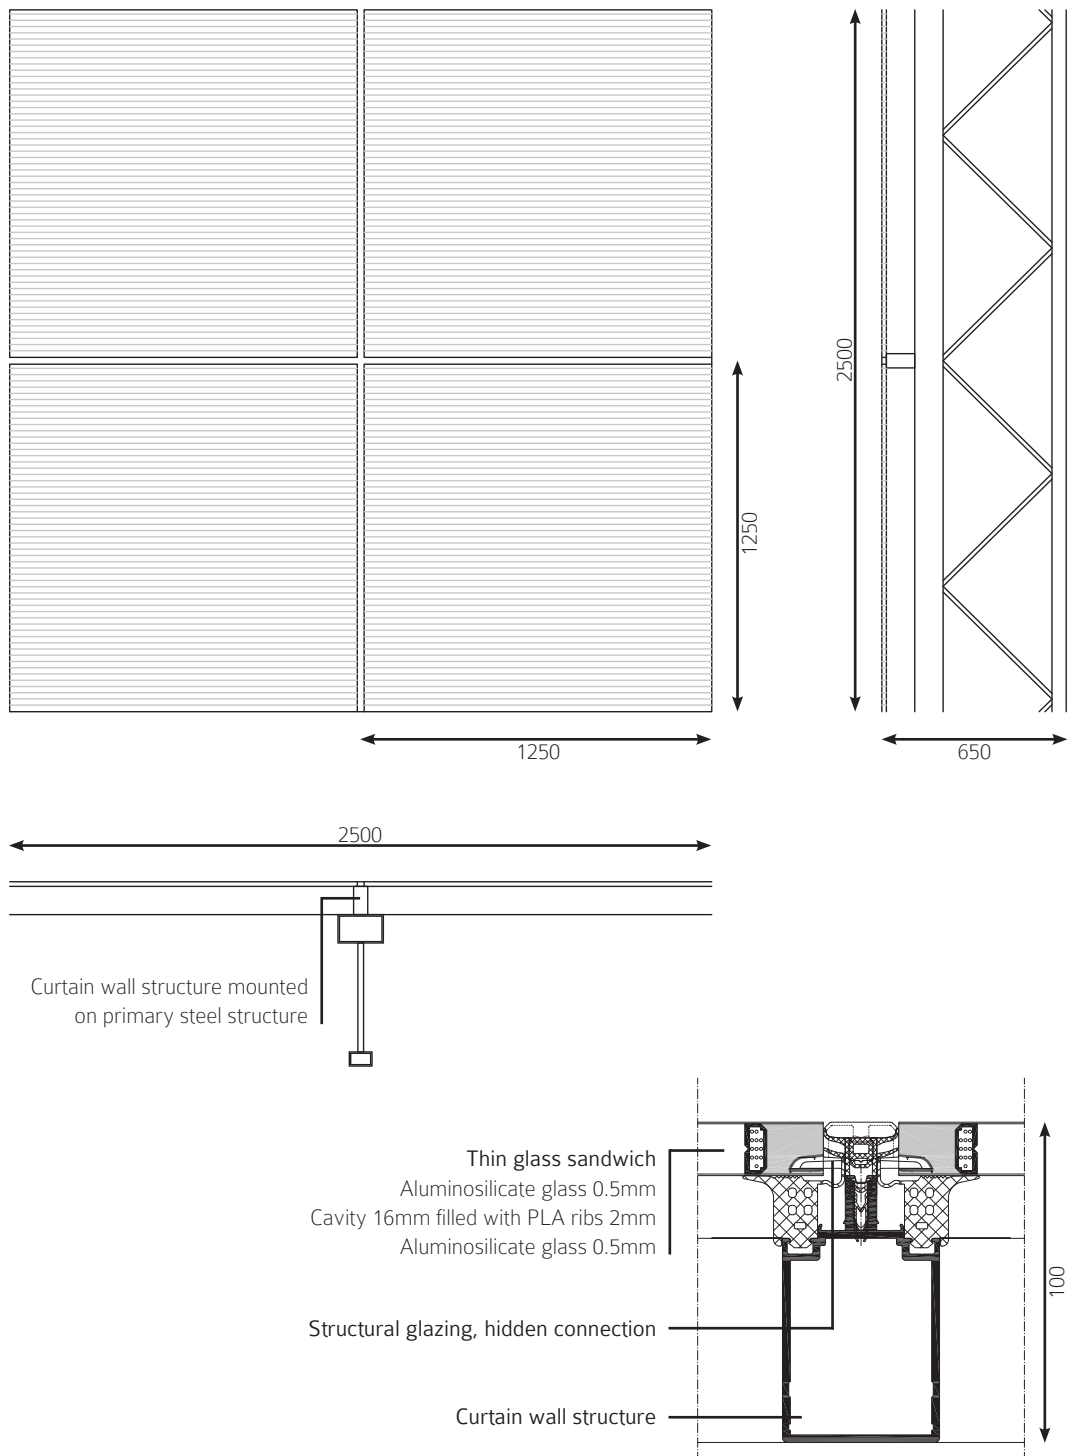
// Façade fragment 1:20 and detail 1:5
